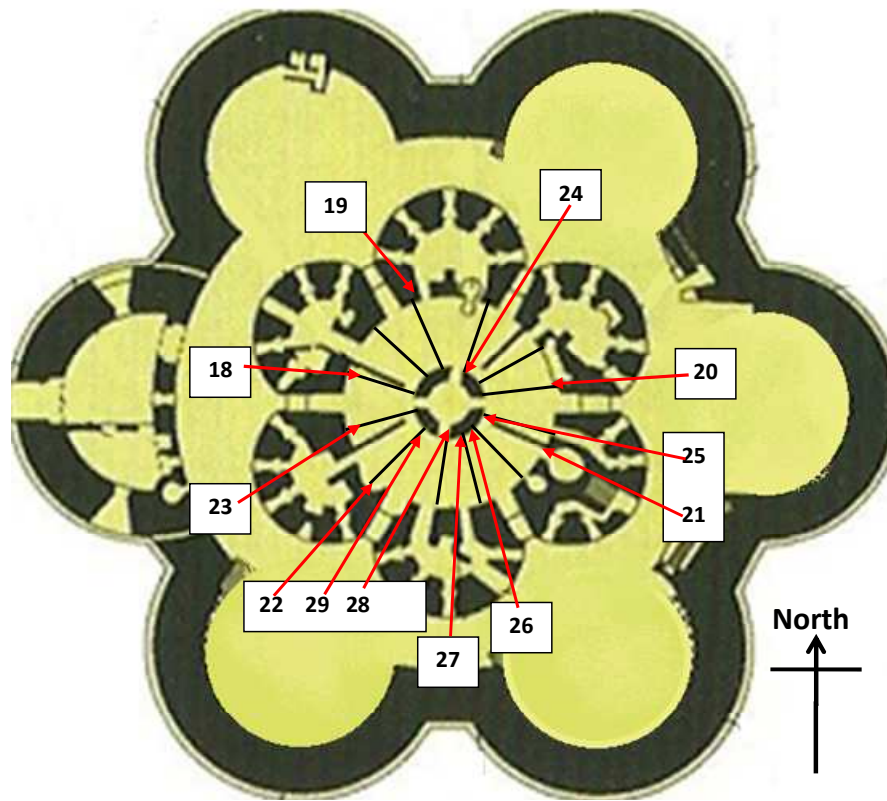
Annotated plan at ground-floor level to help locate sampled timbers (after English Heritage Guidebook: Deal Castle)
